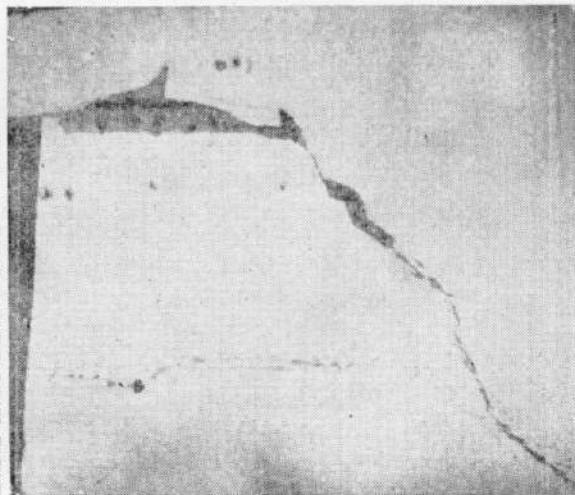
Damage in the interior wall with cracks propagating from door opening in Kennedy's Muslim lines.
